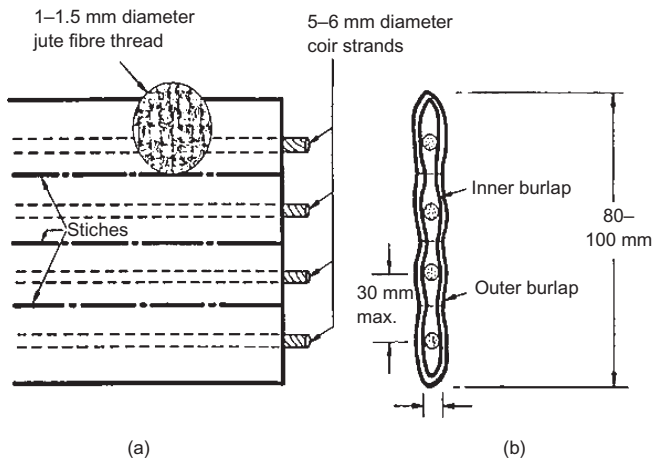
Schematic view of Fibredrain: (a) elevation; (b) cross-section
